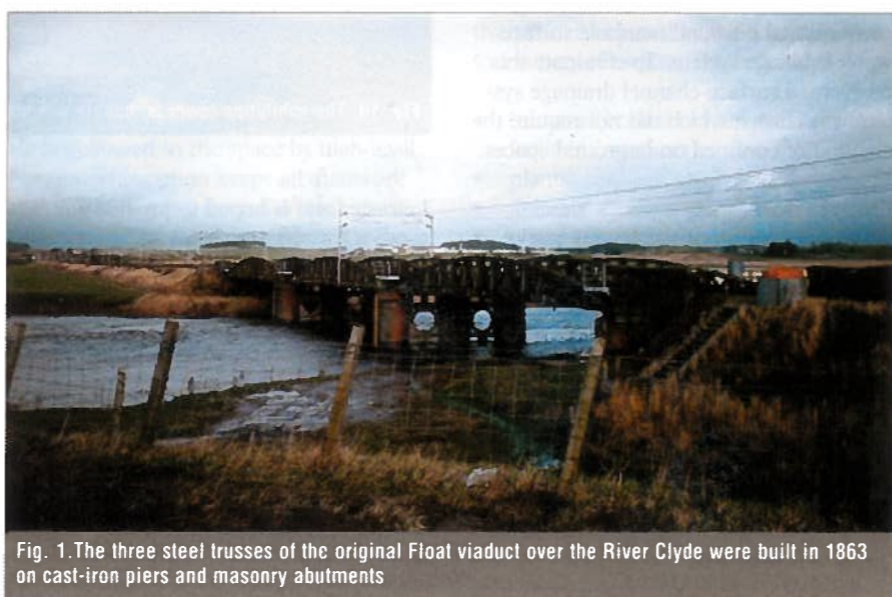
The three steel trusses of the original Float viaduct over the River Clyde were built in 1863 on cast-iron piers and masonry abutments
